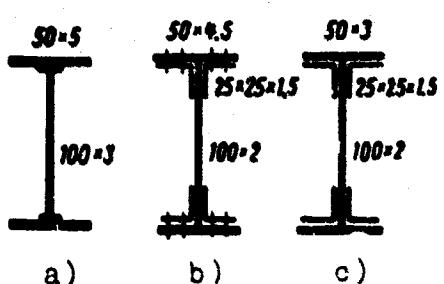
Construction of I-beam: a) welded; b) riveted; c) glued.
